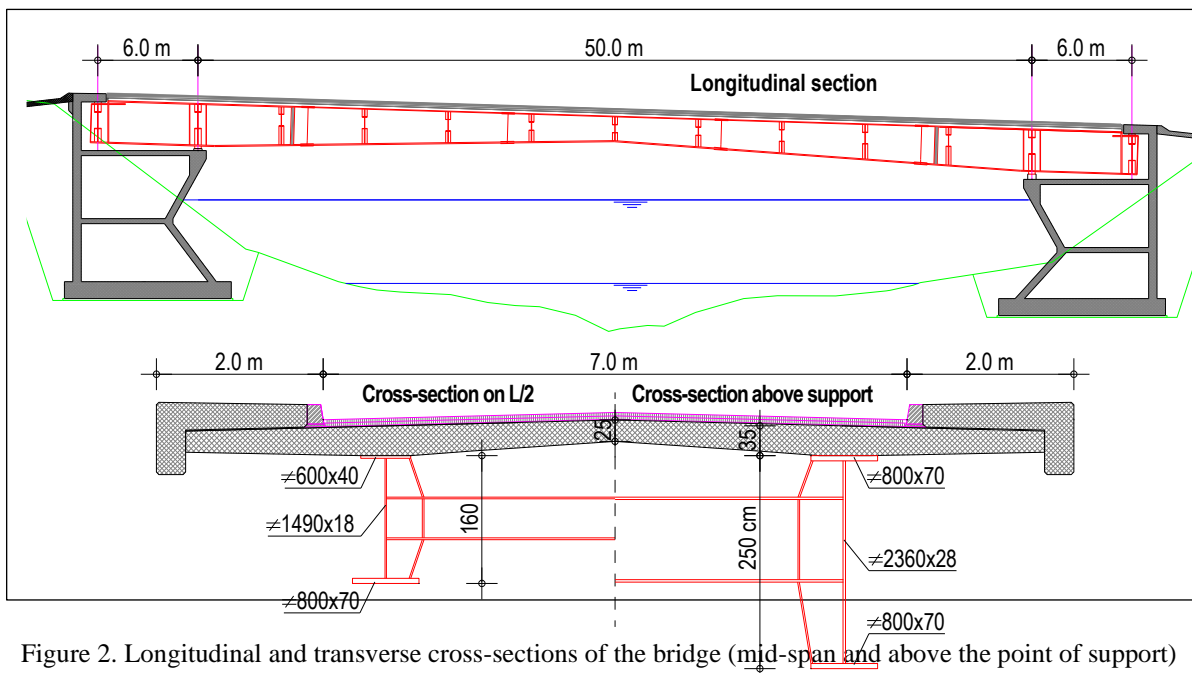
Longitudinal and transverse cross-sections of the bridge (mid-span and above the point of support)
